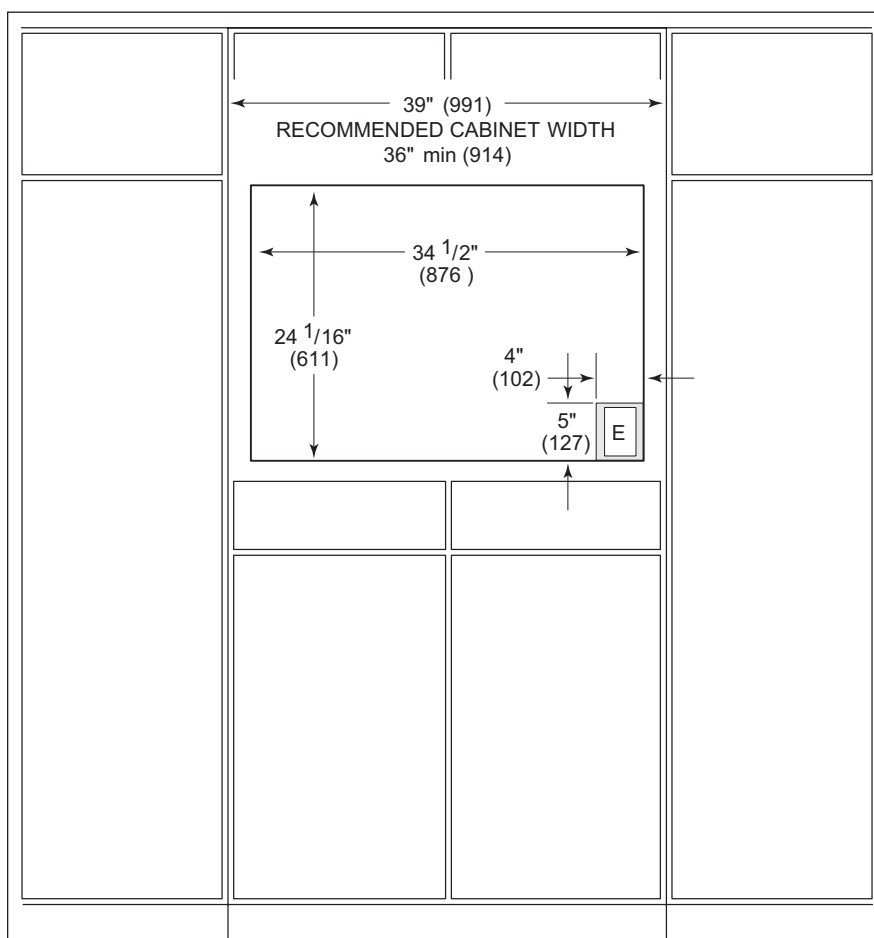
Front Cutout Dimensions and Electrical Placement
